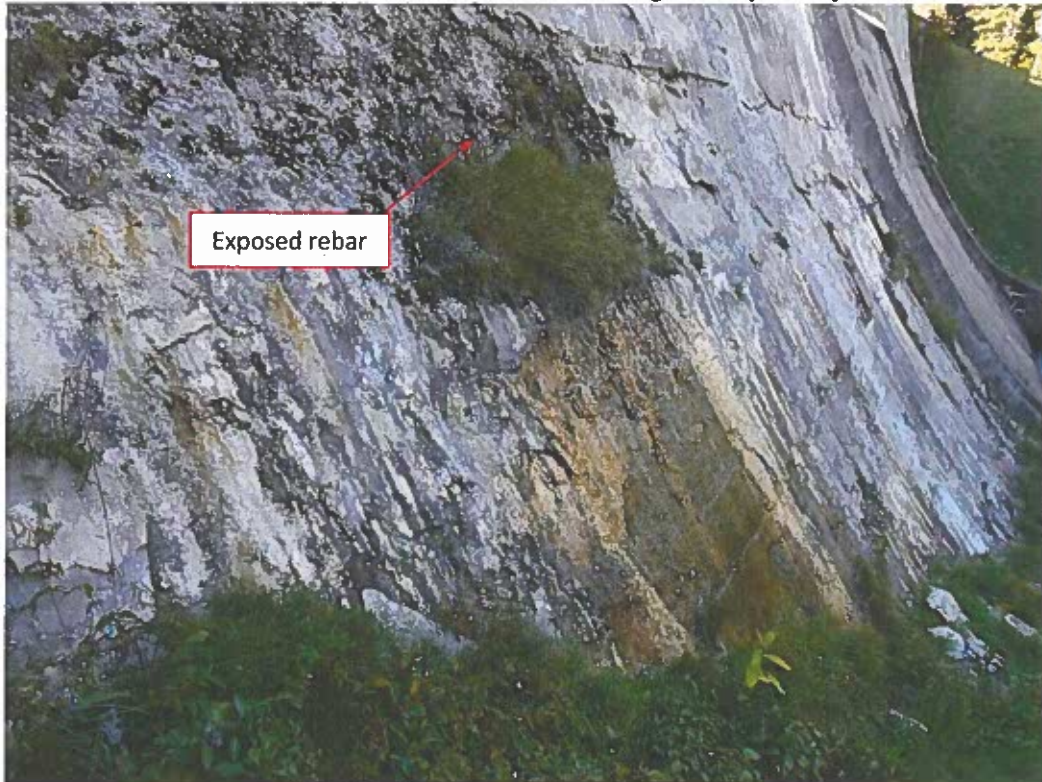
Exposed rebar intended to provide anchorage for shotcrete on the downstream face of the dam to right of spillway.
